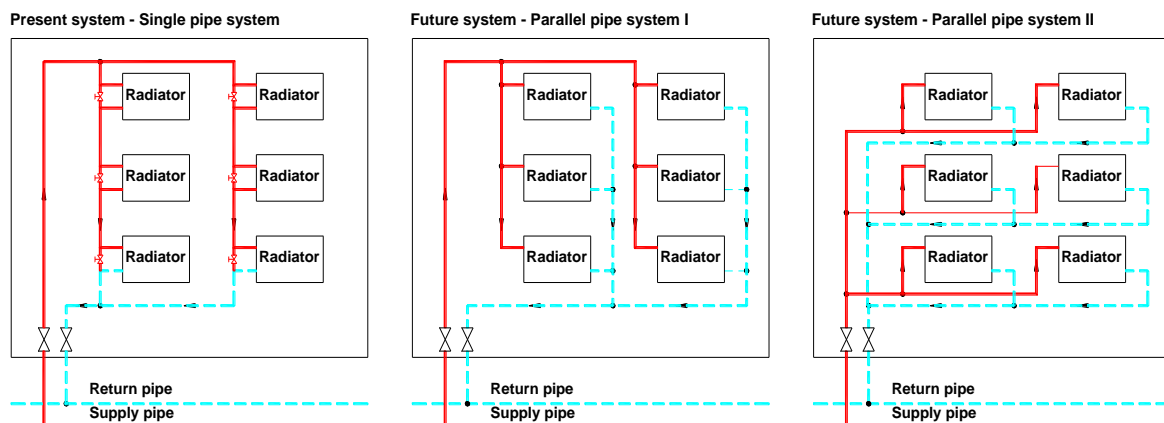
Typical pipe arrangement system in coal heated buildings
